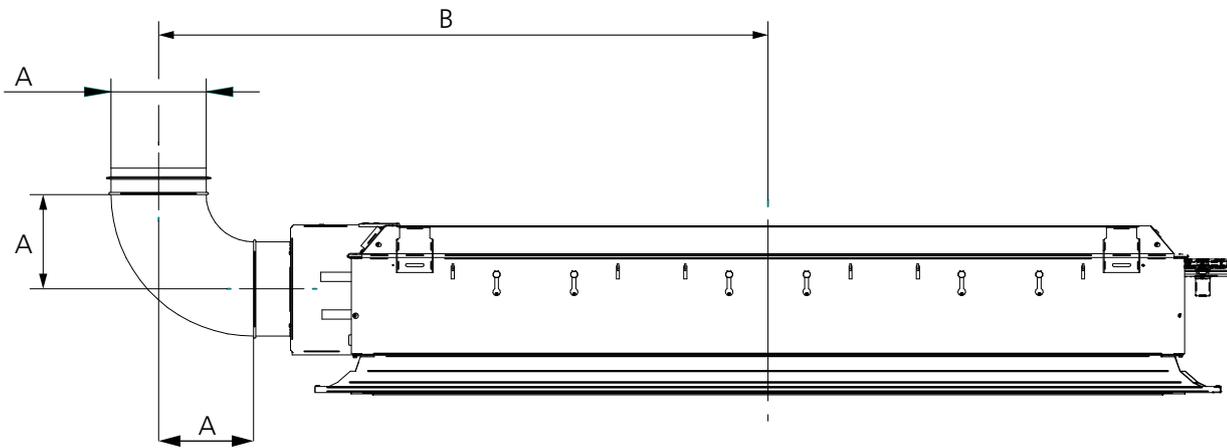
Dimensional drawing, short side connection with bend Ø125/160/200
